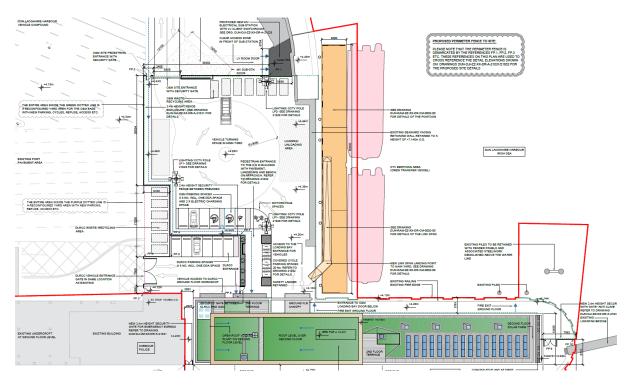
Extract from the Proposed Site Plan – Drawing No. DUN-DJI-ZZ-XX-DR-A-21021
